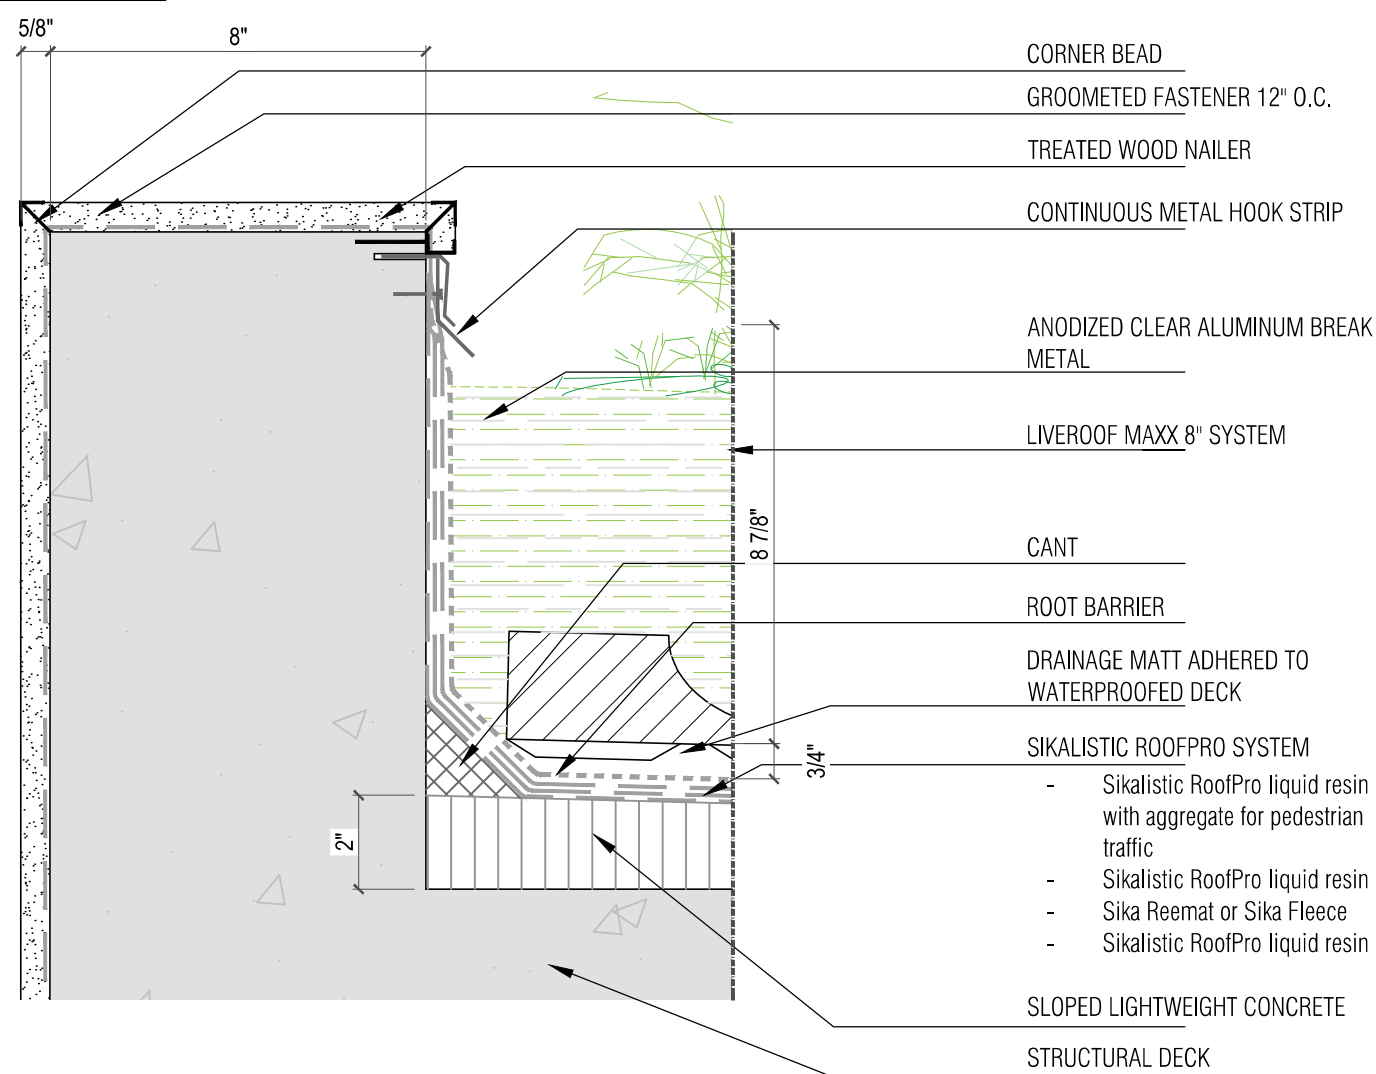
GREEN ROOF LARGE PLANTER OVERFLOW DRAIN
